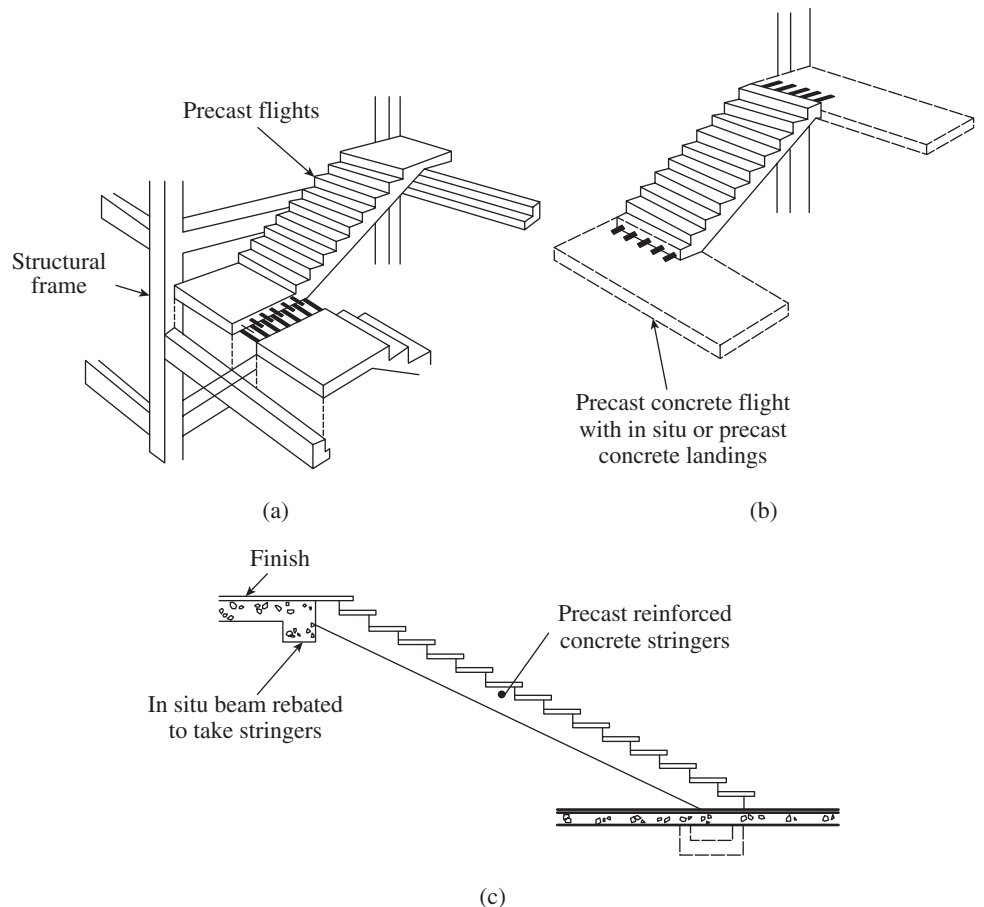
Precast concrete flight, landing, or stringers (a) Precast flight (b) Precast concrete flight with landing (c) Precast stringers
